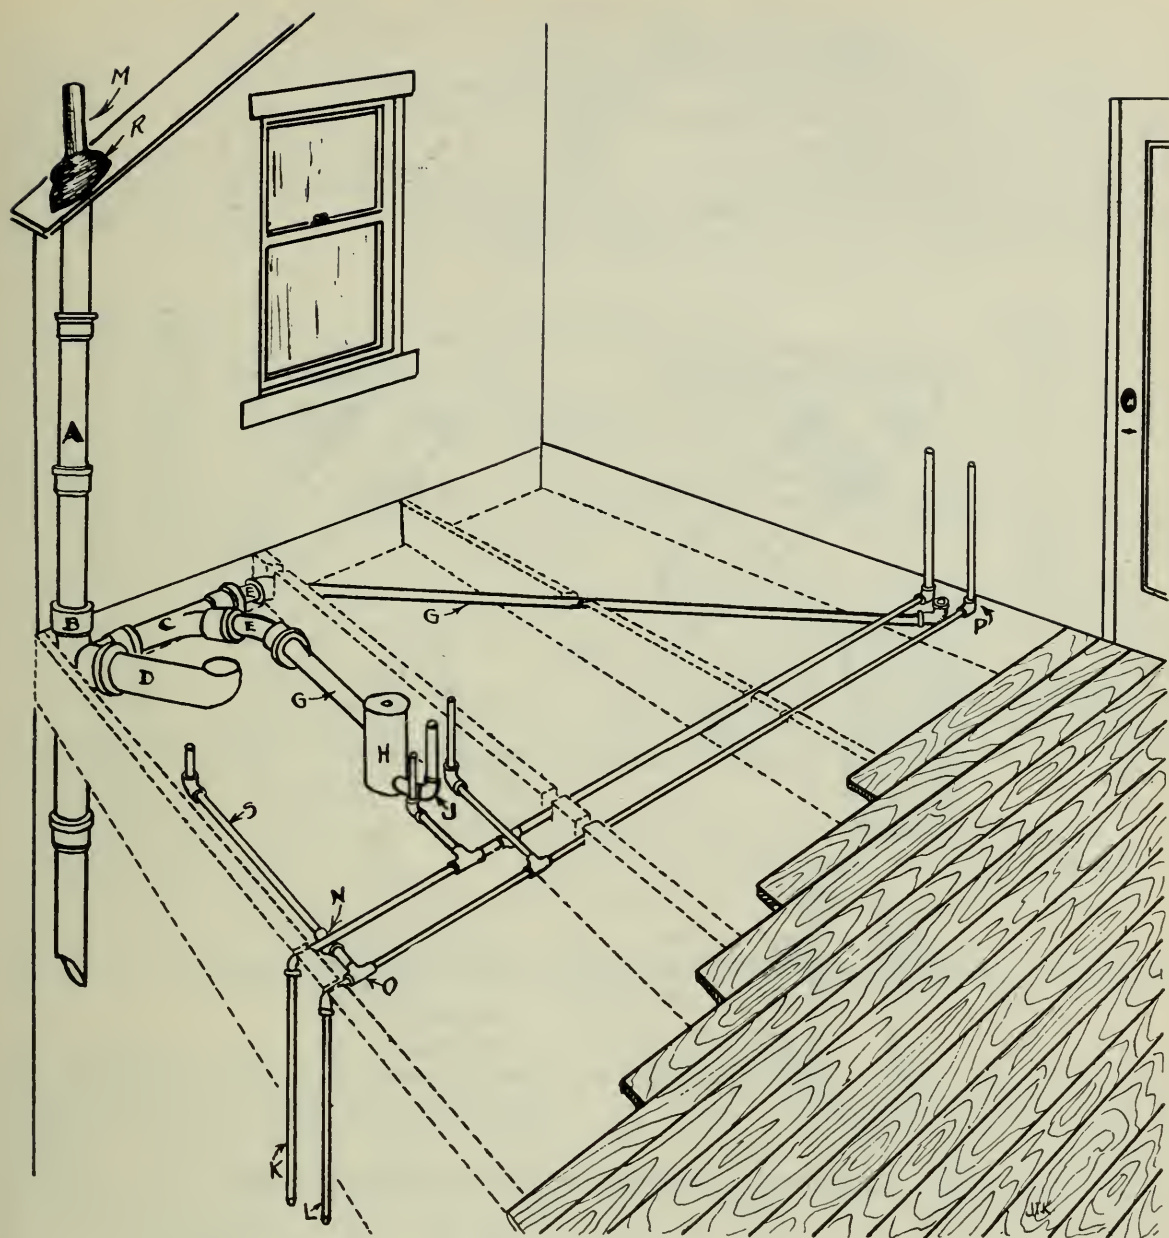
A detailed layout of bathroom pipes, using wrought iron pipe for waste pipes and thereby eliminating the use of wiped joints.
